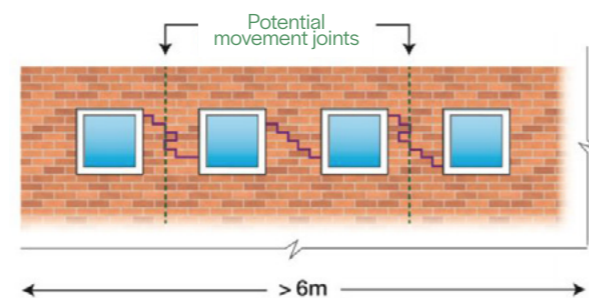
Long runs of uninterrupted brickwork, especially when vertical loading is low, can lead to diagonal cracking of narrow brickwork panels between window openings.
